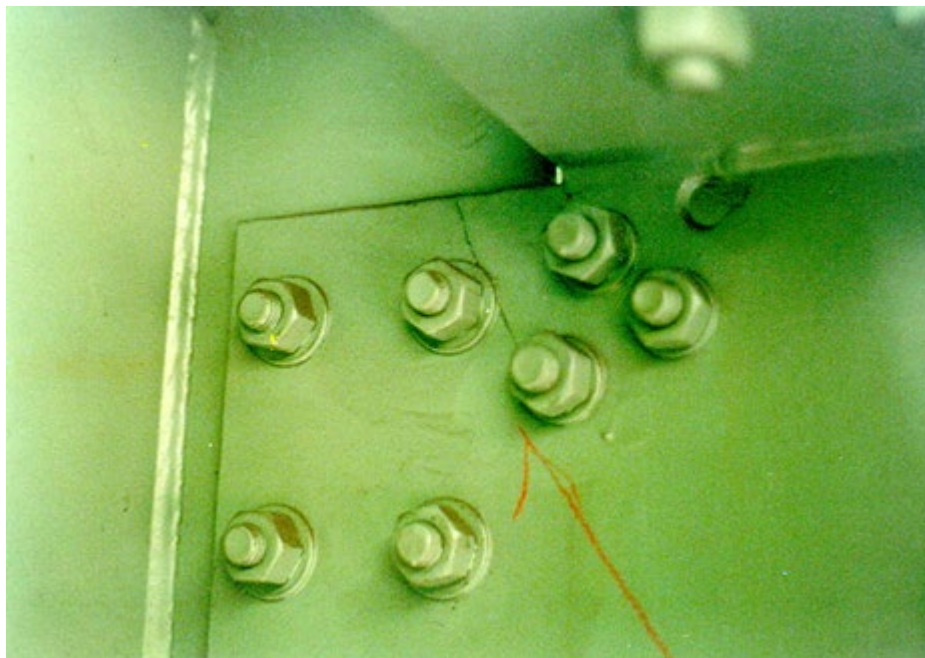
Fatigue Cracks in the Web of a Floorbeam at the Top Flange Cope. Stopper holes have been drilled and bolts installed in the holes.
